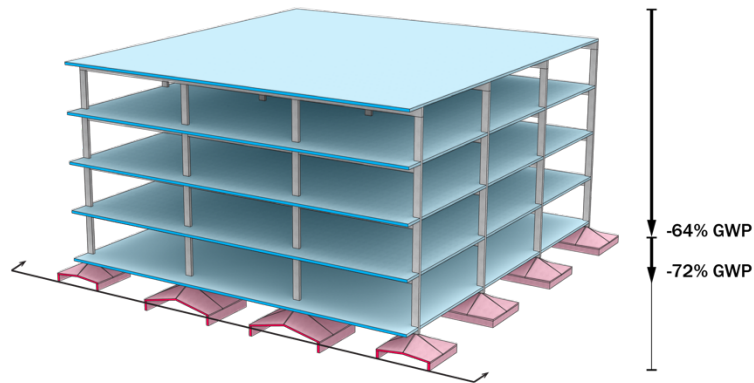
Global warming potential savings with optimized floor slabs and shell foundations
